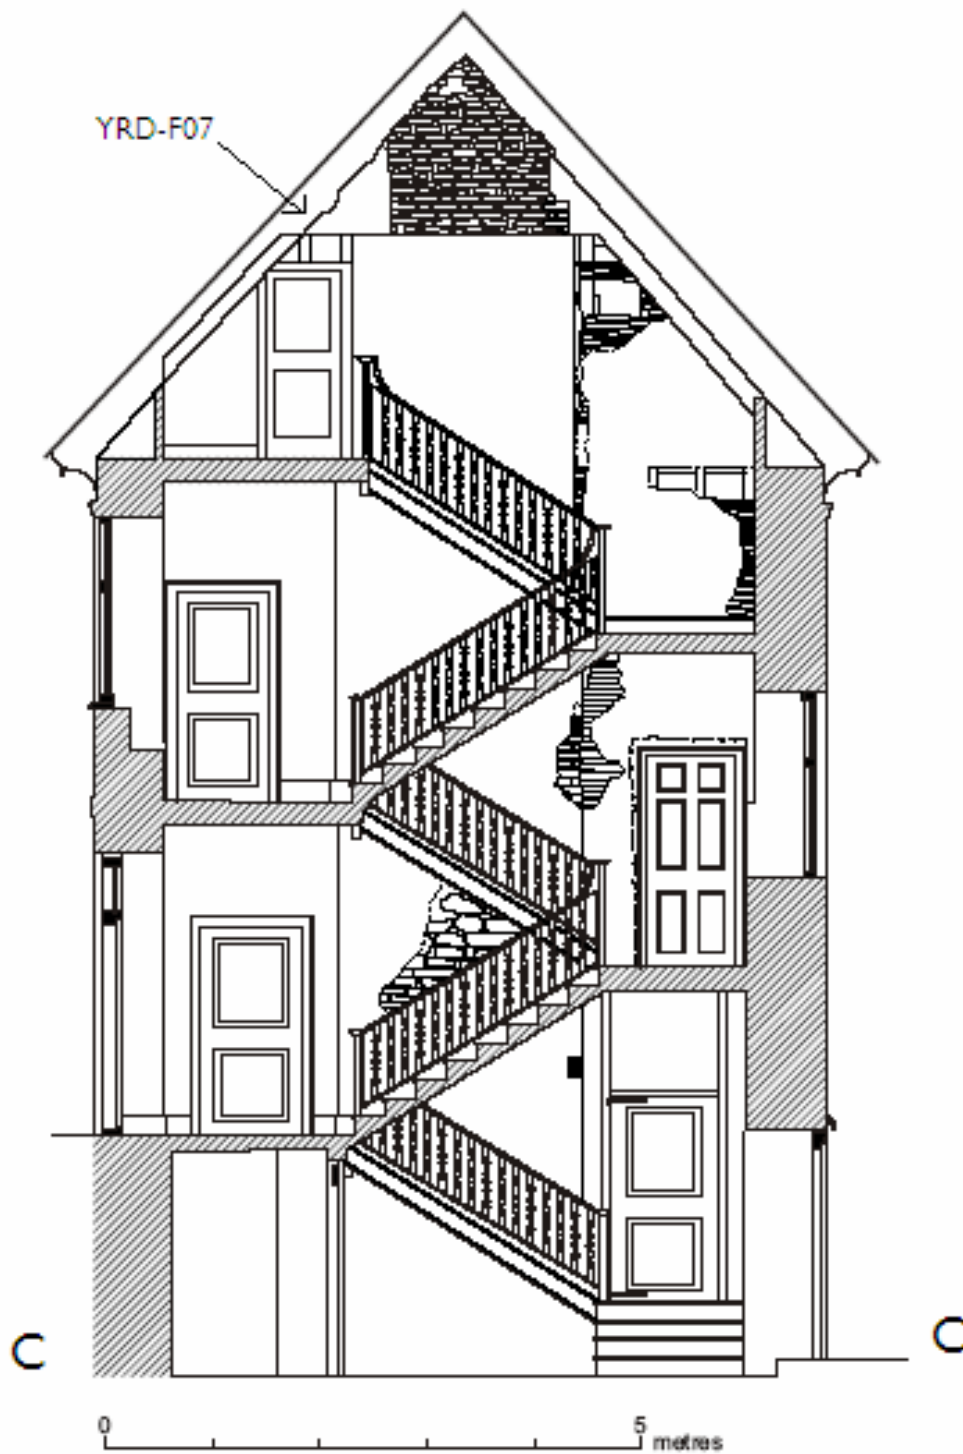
South range; east facing section C–C, showing the location of sample YRD-F07 (John Allan, location of section marked on Fig 8)
